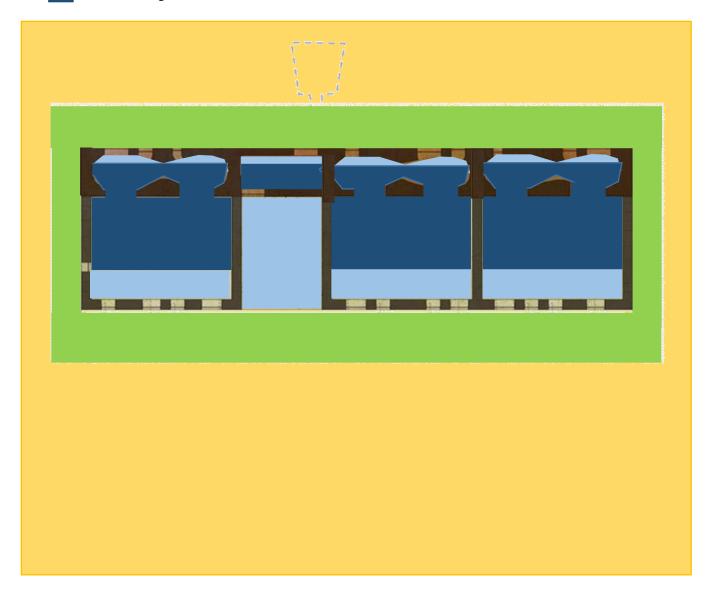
Bottom Floor Plan: Prospect and Refuge
